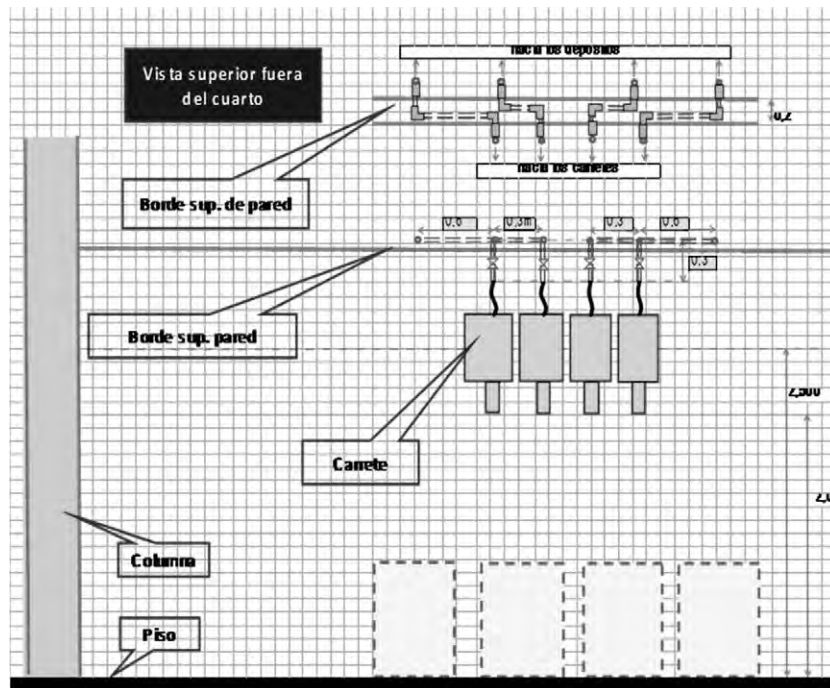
Piping Layout (Outside the Room) (Unit: mm)
